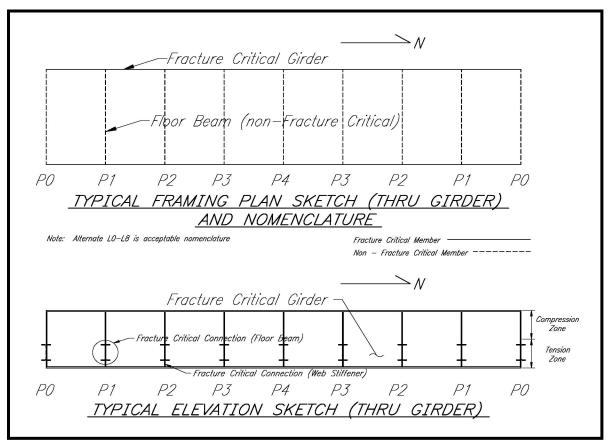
4-5: Typical Inspection Plan Sketches (Through Girder)
